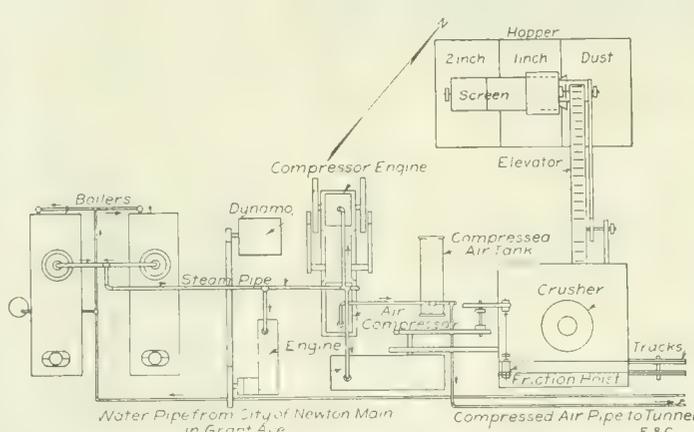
Sketch of Contractor's Plant at West Portal of Waban Hill Water Tunnel, Newton, Mass.
